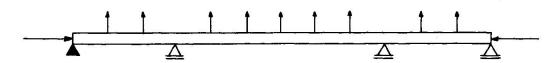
Prestressing effects on the stiffening girder of a prestressed concrete suspension bridge
